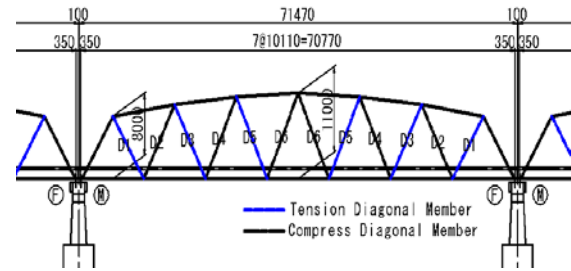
Steel truss bridge investigated (Matsumoto and Yamaguchi 2010)
